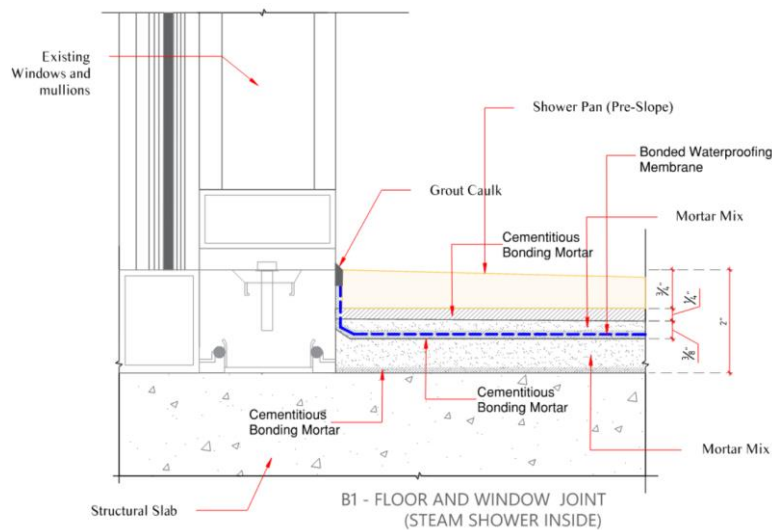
Steam-Shower Interior Window Joint Detail Showing Bonded Waterproofing Return at the Vertical Interface and Sealed Finish Joint at the Perimeter
